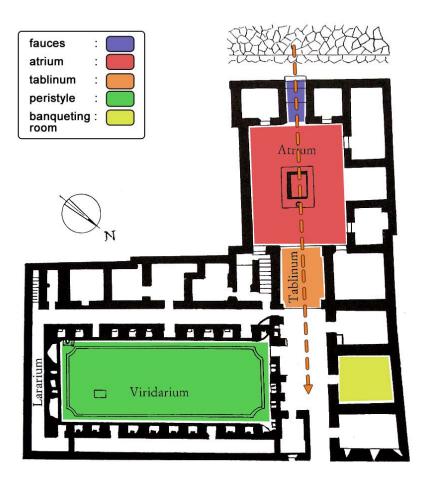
The Plan of the House of the Anchor, VI, x (adopted from Zanker, 1998, 161)
